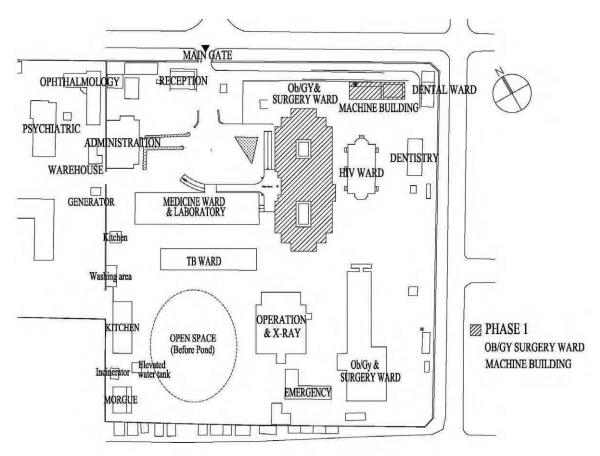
Layout Plan for Phase 1 Construction Work
